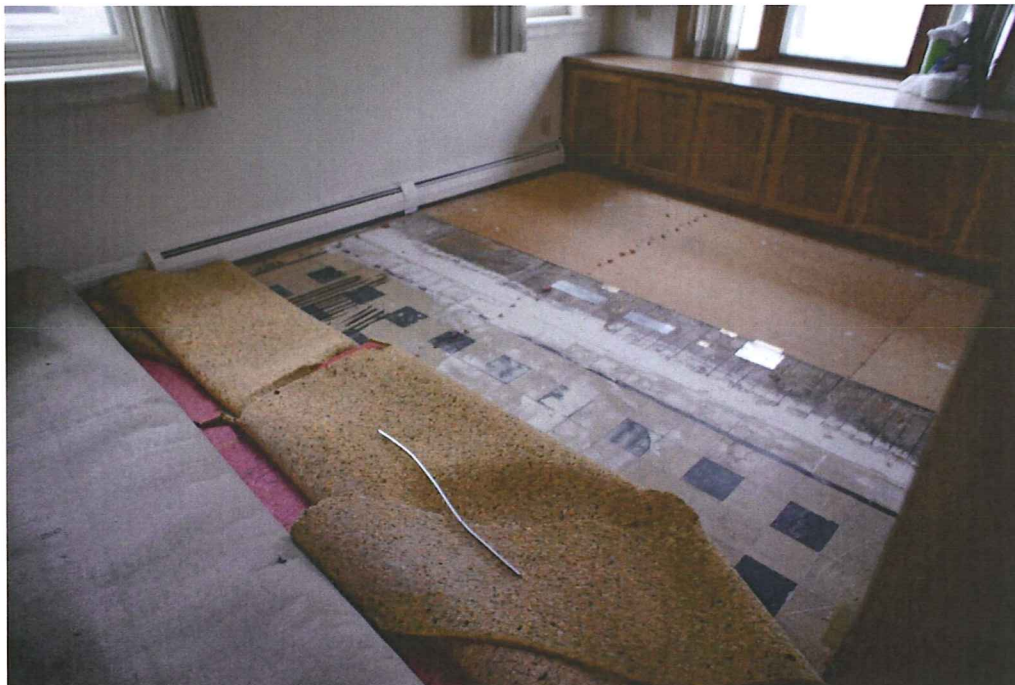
Dining room and living room extend into "bump outs" from 1980's remodeling. Walls are partially drywall and partially plaster. All trim and built in cabinets not original to house. Flooring is a mixture of asbestos containing tile, damaged wood and raw subfloor.
